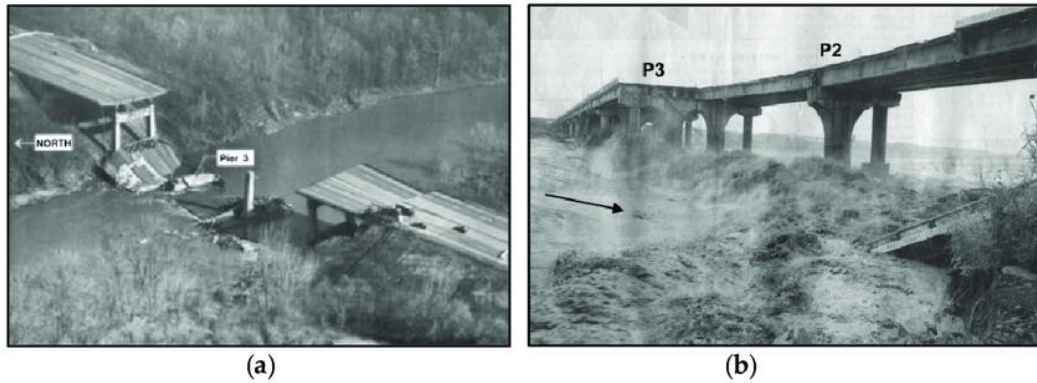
Collapses of bridge pile foundations: (a) Schoharie Creek Bridge; (b) Houfeng Bridge.
